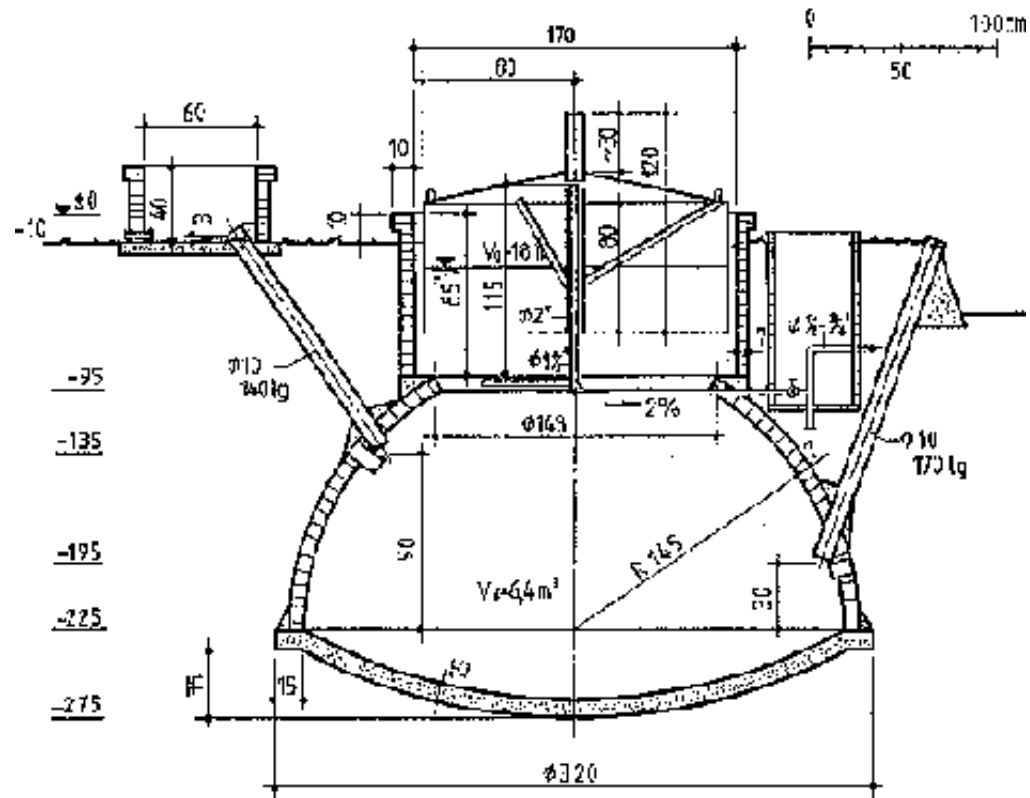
Constructional drawing of a floating-drum plant. $V_d = 6.4 \text{ m}^3$, $V_g = 1.8 \text{ m}^3$. Material requirements: Excavation 16.0 m³, Foundation 1.6 m³, Masonry 1.1 m³, Rendered area 18.0 m², Sheet steel 5.7 m². (Source: OEKOTOP, Sasse)
